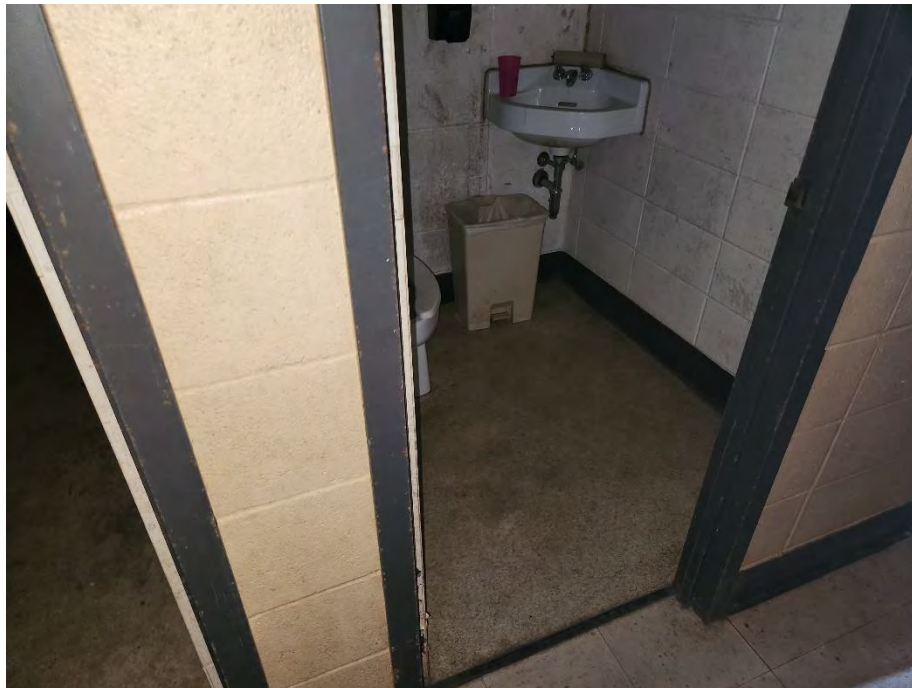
This photograph shows the ACM green/yellow sheet vinyl flooring and white mastic (MC-SV01) found in the bathrooms of the Medical Clinics building.
